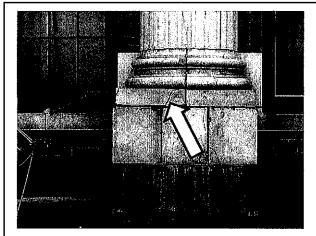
Cracked stone at the base of the pillar on the South elevation
